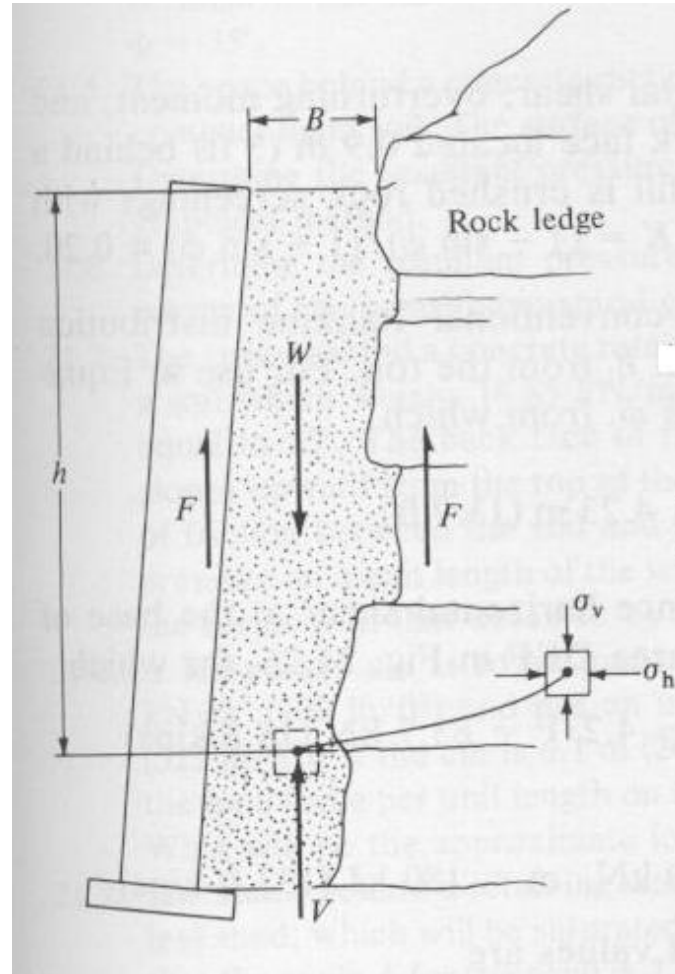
Fascia retaining wall of backfill width B and wall friction F
